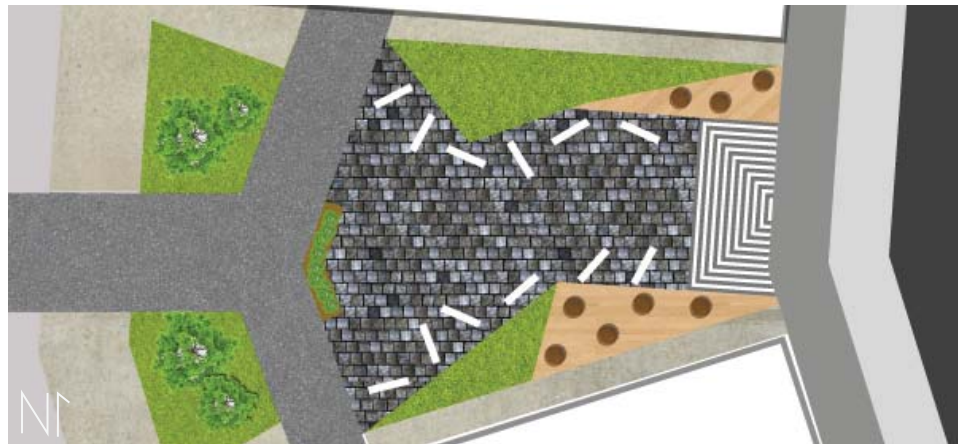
Plan for Pocket Park, Original Scale 1"=20'
